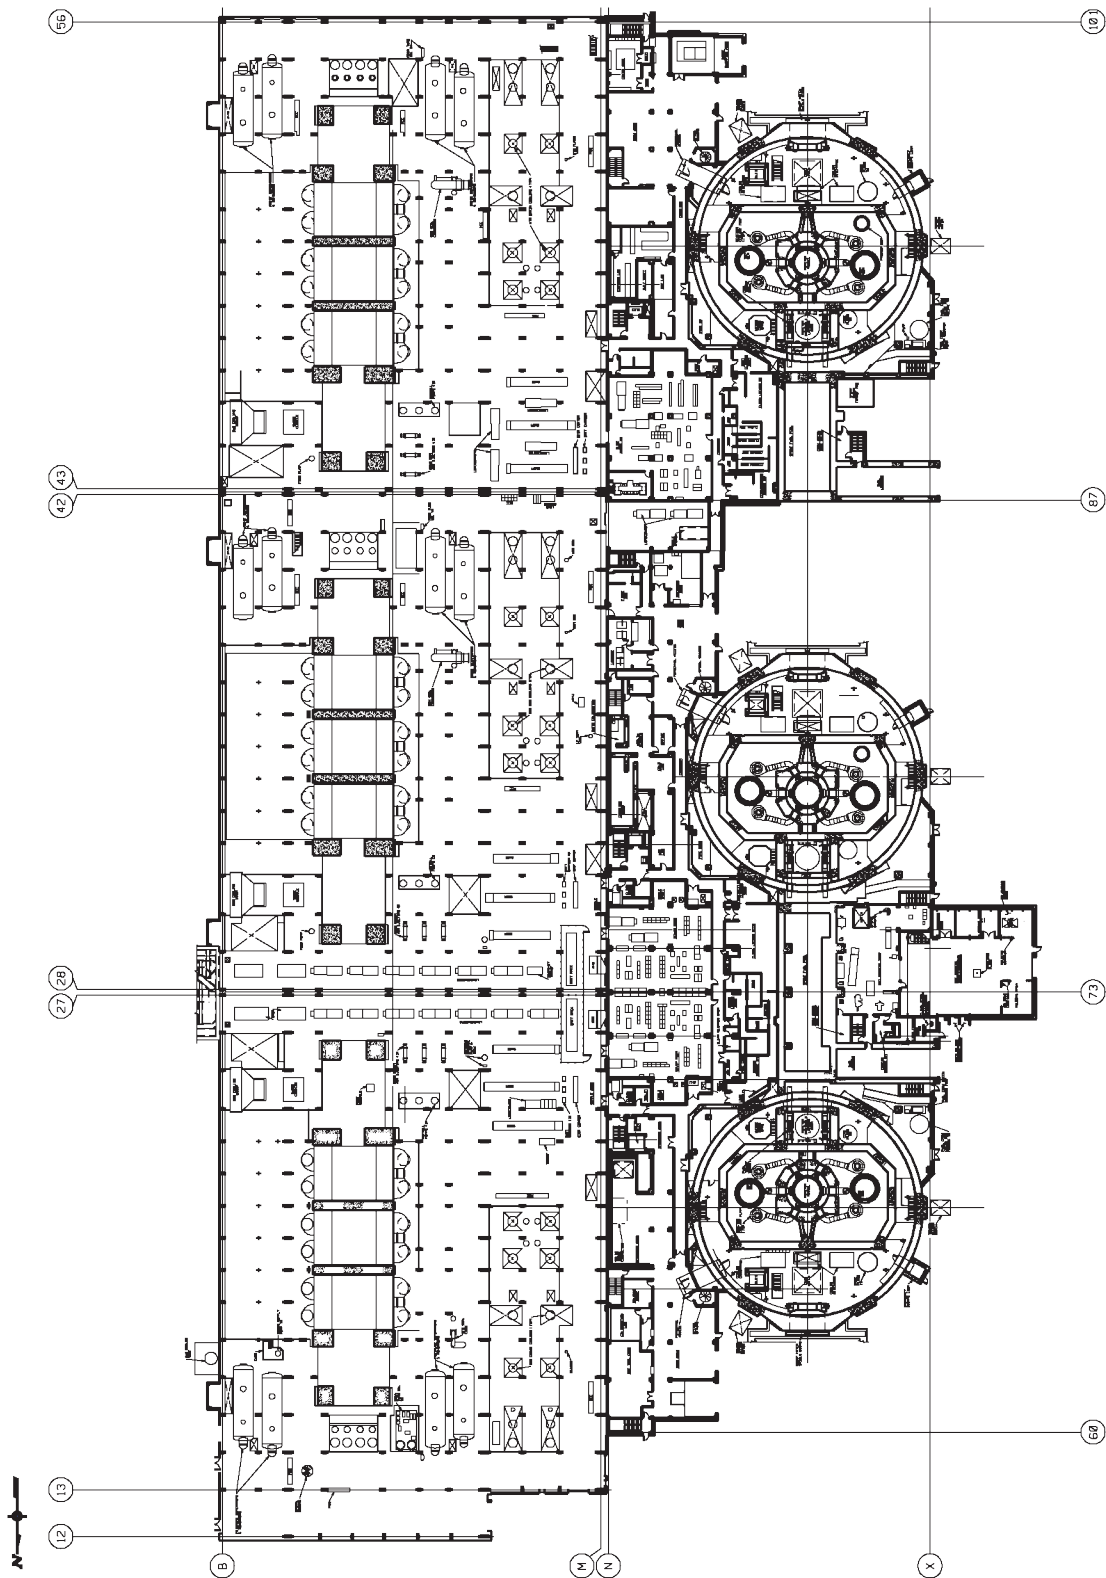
Architectural drawing showing the floor plans of Reactor Buildings 1-3 (SHPO Site Nos. 0148.01-0148.03) and Turbine Building (SHPO Site No. 0148.01).
